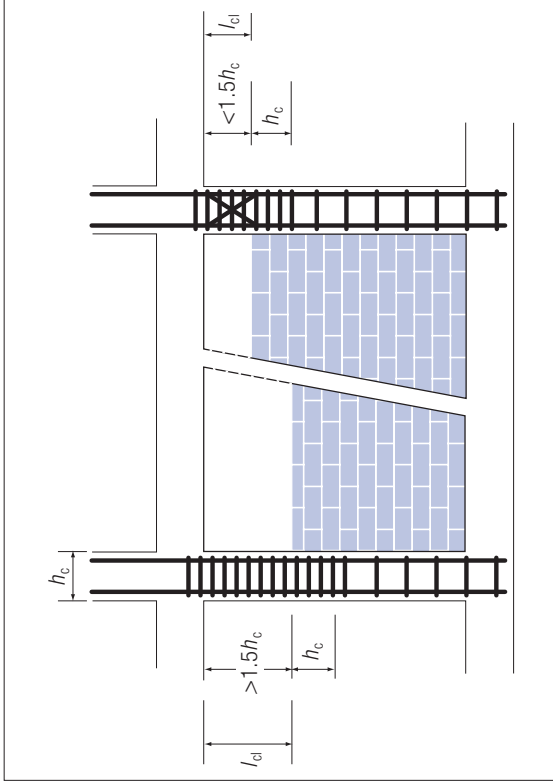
Partial masonry infill – arrangement of shear reinforcement in the columns
